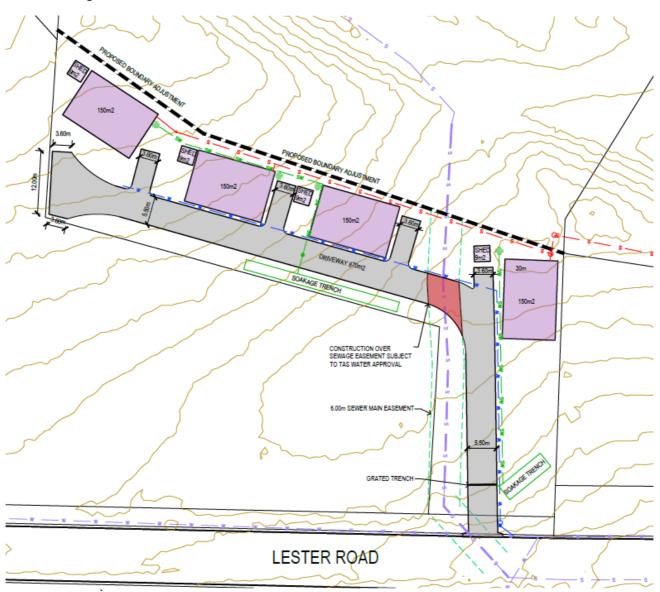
Indicative site capacity testing plan (Source: Flussig Engineers)
